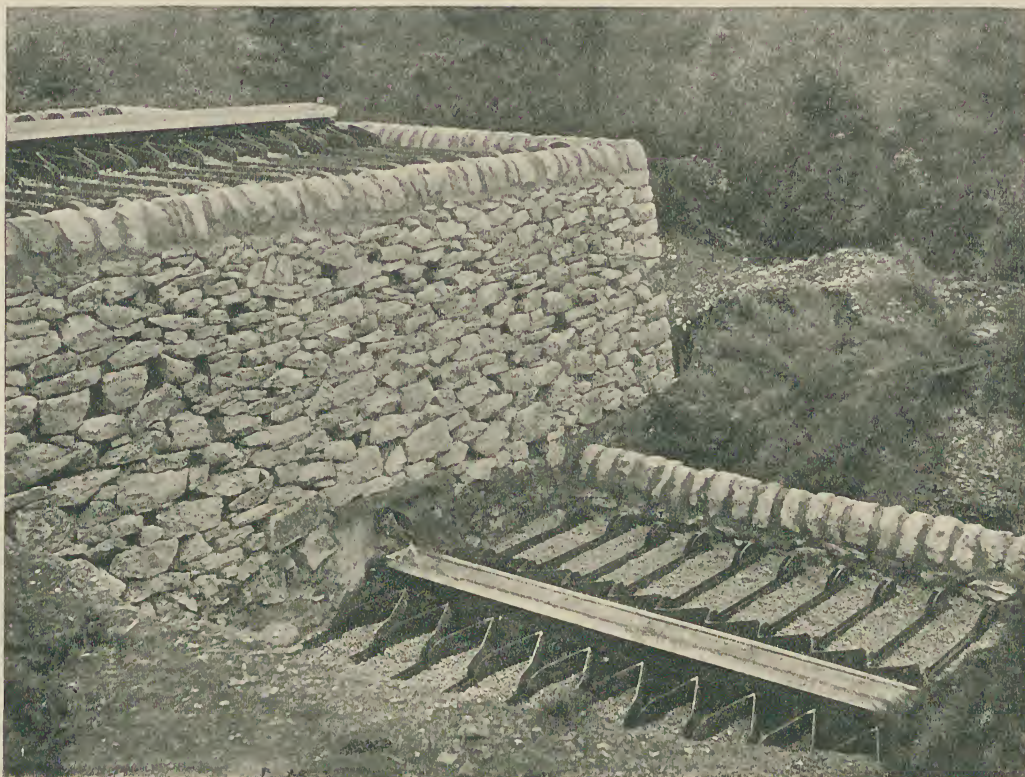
Sewage Works, Thornbridge Hall, Derbyshire.
